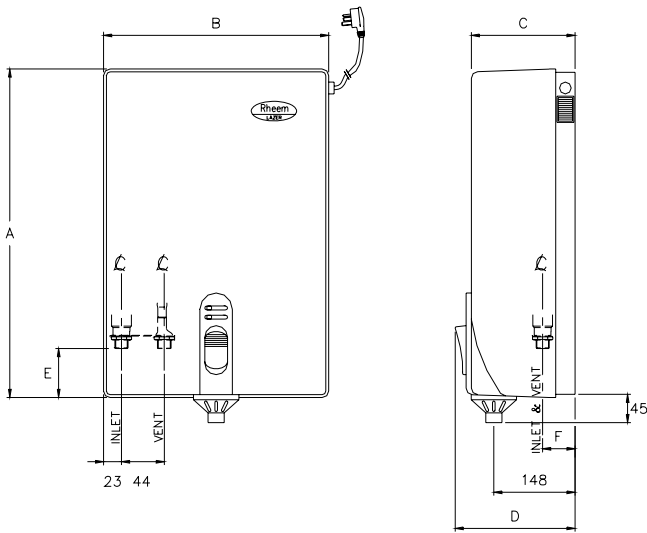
Dimensions of Rheem Lazer Designer Series boiling water units
